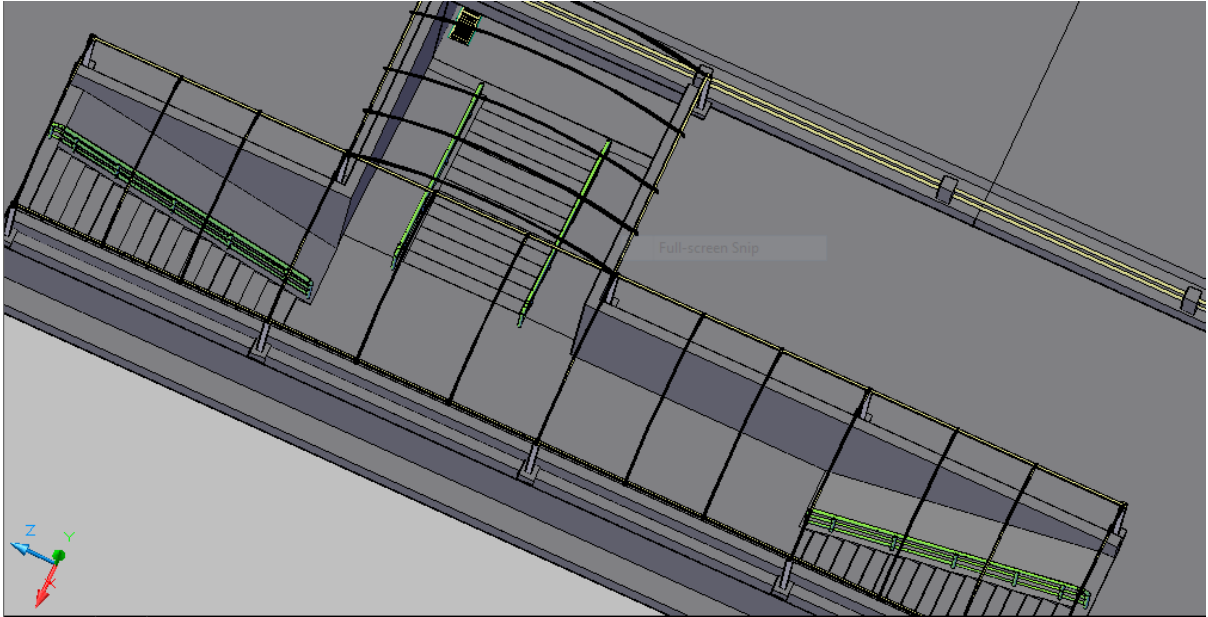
Underpass pedestrian crossing that connects the two sides of walkway on railway.
